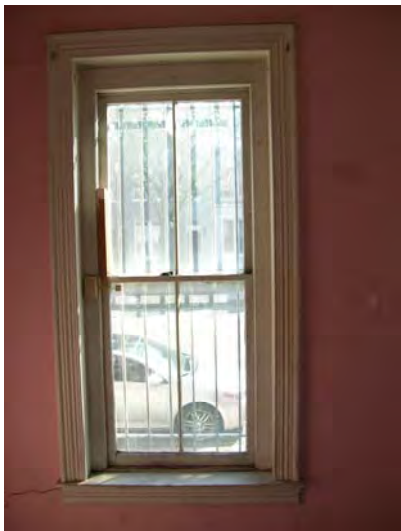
Typical east elevation window. (Photo: BBB, 2006)
